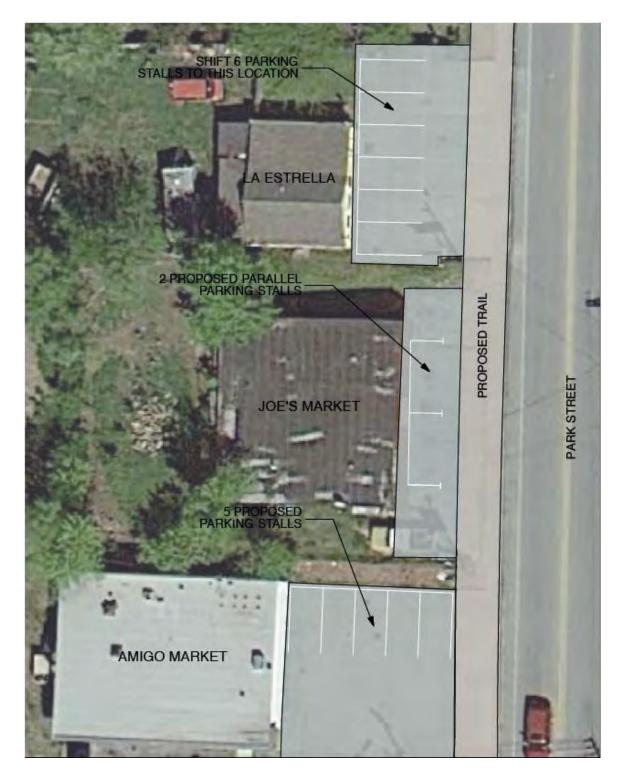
Photo Illustration of New Parking at Joe's and LaEstrella
